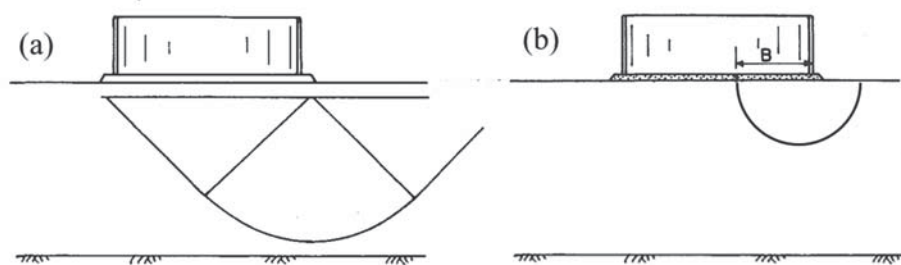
Tank stability failure mechanism, (a) Base shear failure, (b) Edge shear failure (Duncan et al., 1984)
